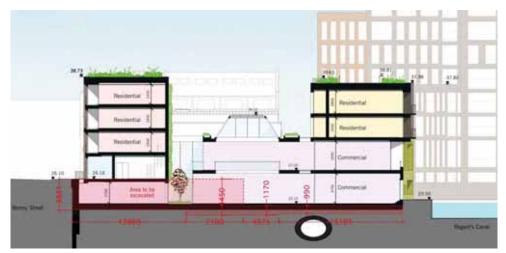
Proposed Section Showing Extent of New Basement Excavation
